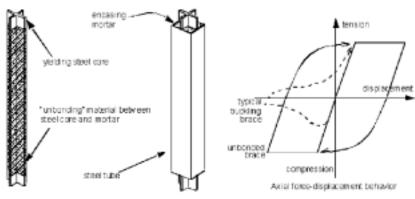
Unbonded brace concept and typical hysteretic behavior.
